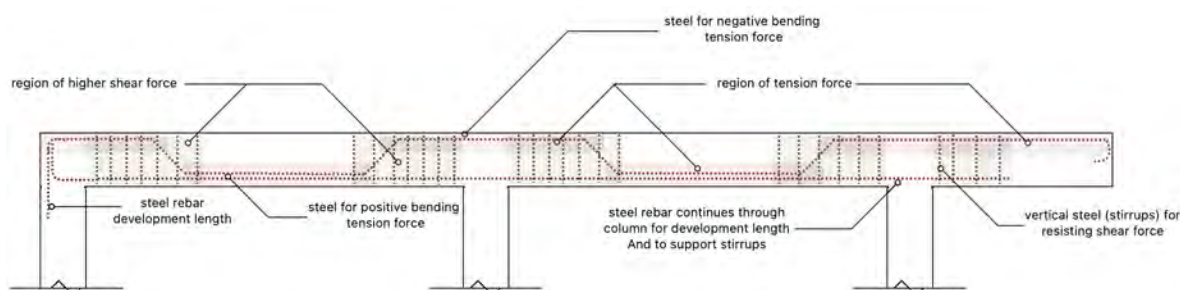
Steel reinforcement in a continuous concrete beam.
